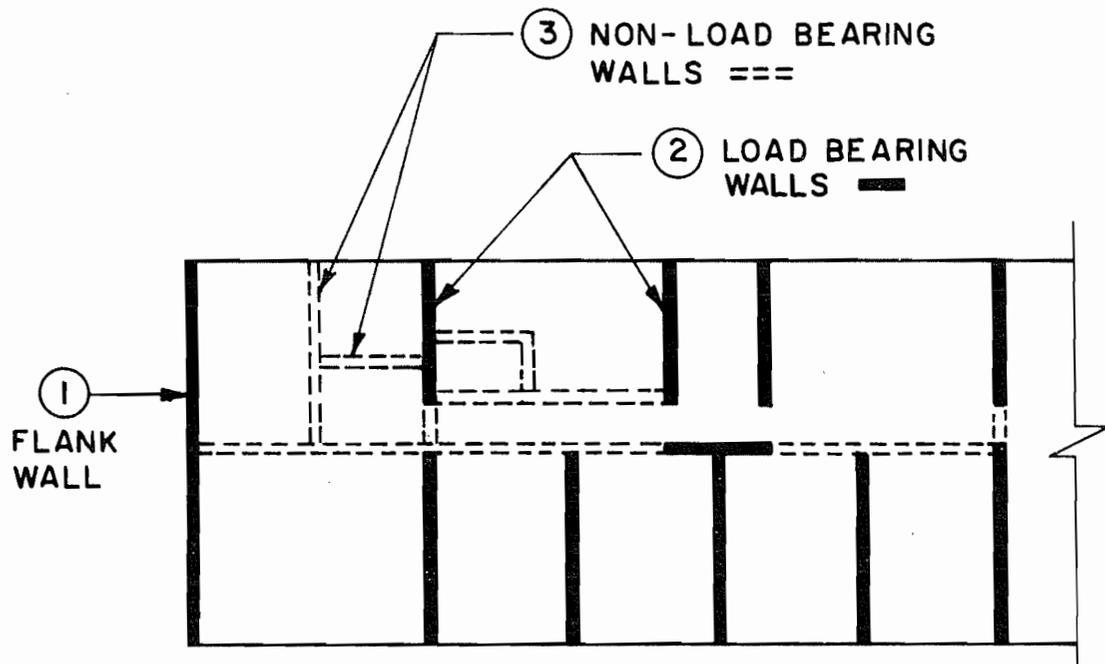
REPRESENTATIVE APARTMENT BUILDING LAYOUT.
